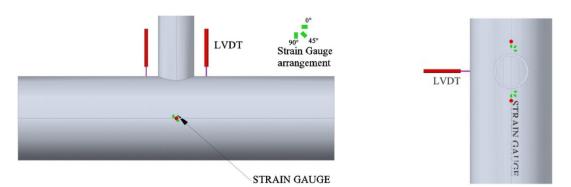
Instrumentation arrangement on specimen (Front view and top view)
